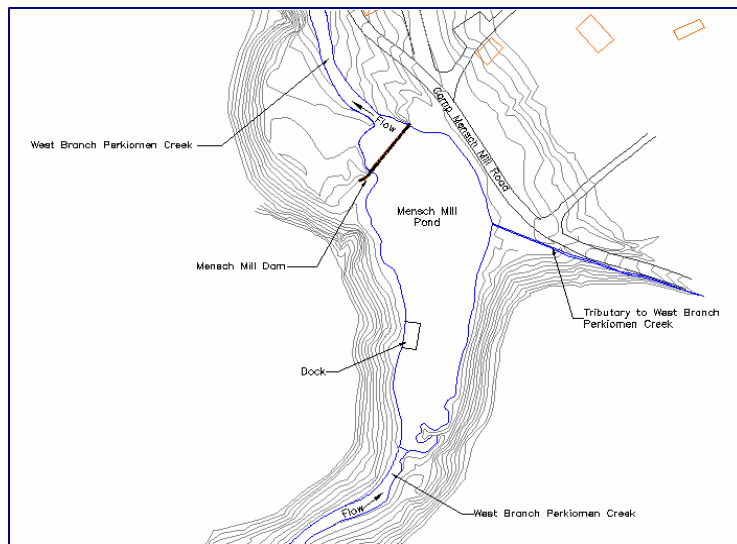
Plan view of Mensch Mill Dam and Impoundment
